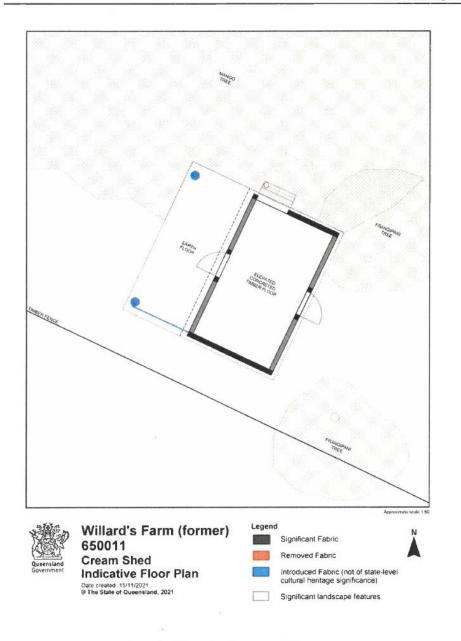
Indicative floor plan - Cream Shed (Queensland Government, 2021)
